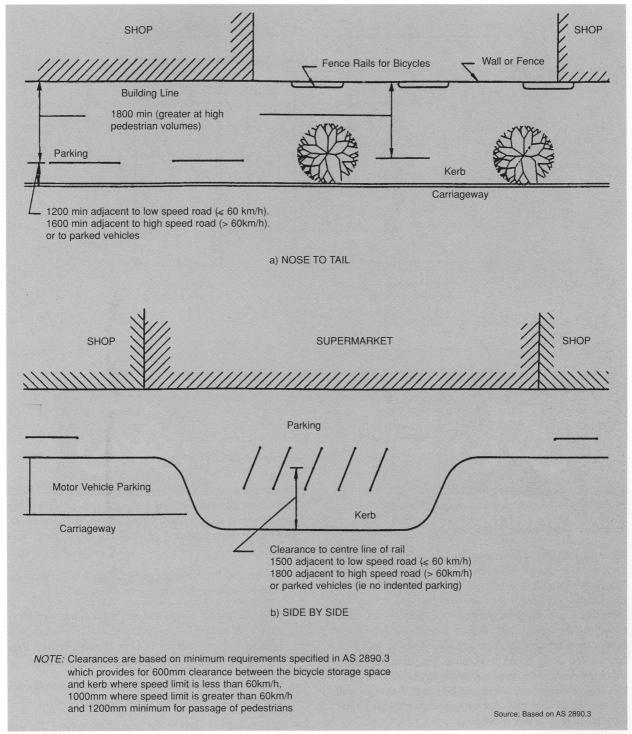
Typical Layouts of Parking Rails on Footpaths
